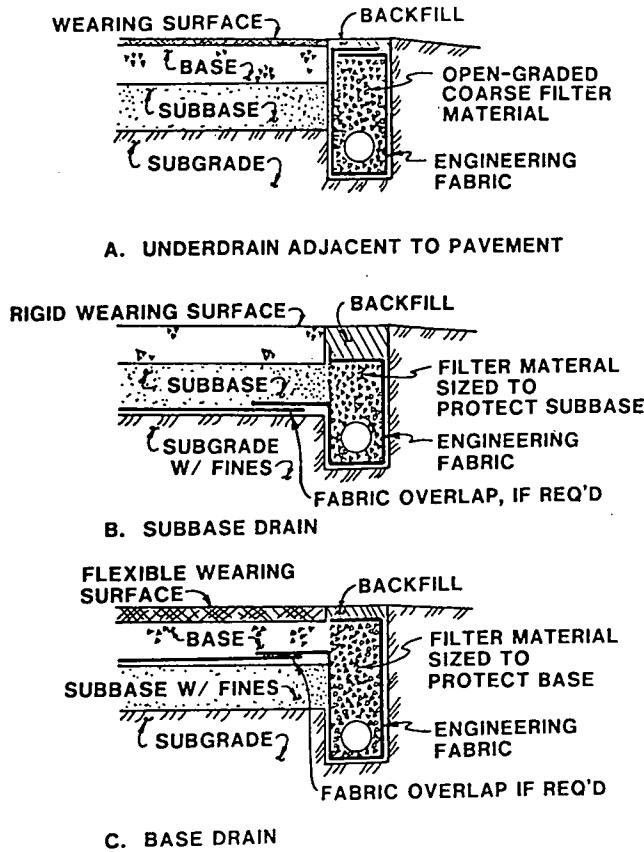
Various uses of engineering fabric to promote/enhance pavement structure design (16).
